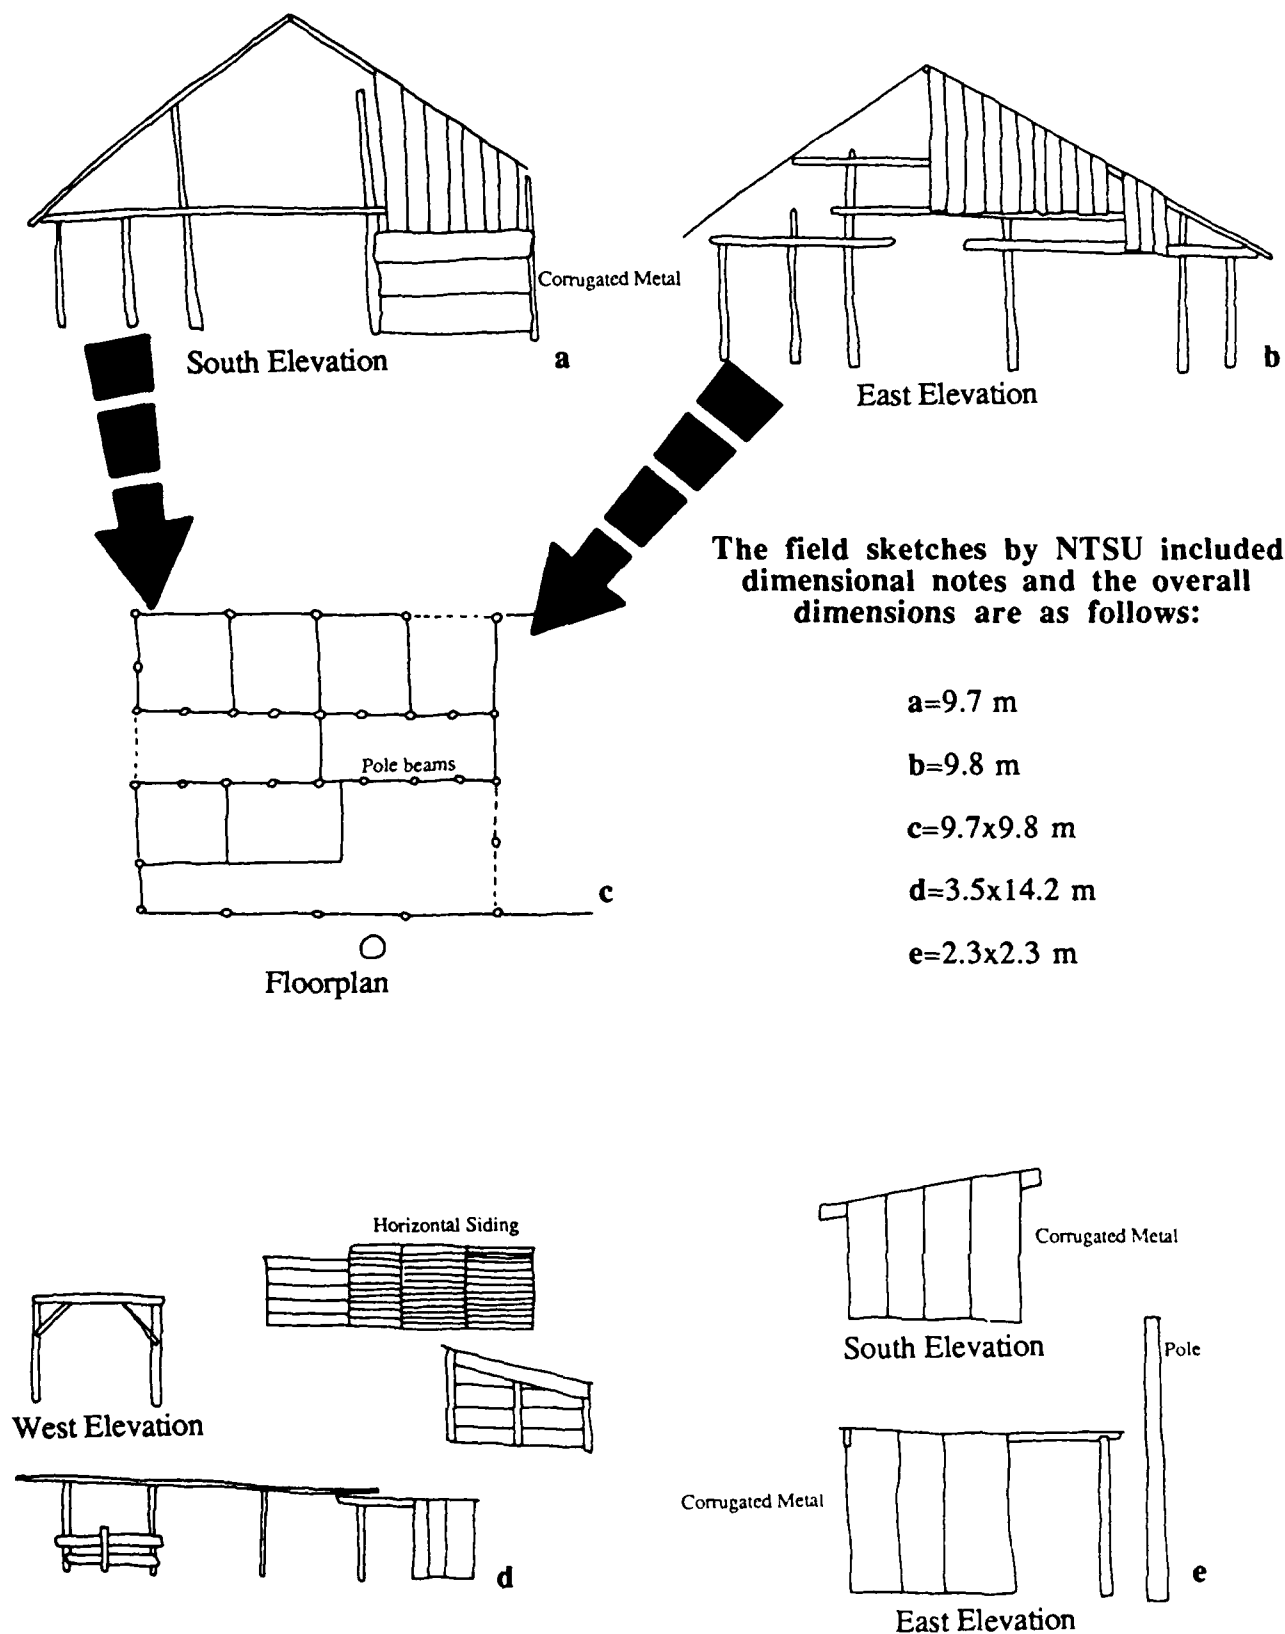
Field sketches (scale is approximate) of the elevations (a,b) and floor plan (c) of the Hintze barn (overall dimensions are 9.7 x 9.8 m). Construction elements of a large shed (d) and a small shed (e) on the north and south peripheries of site 41DL181. Ground surface is at the bottom of each sketch.
